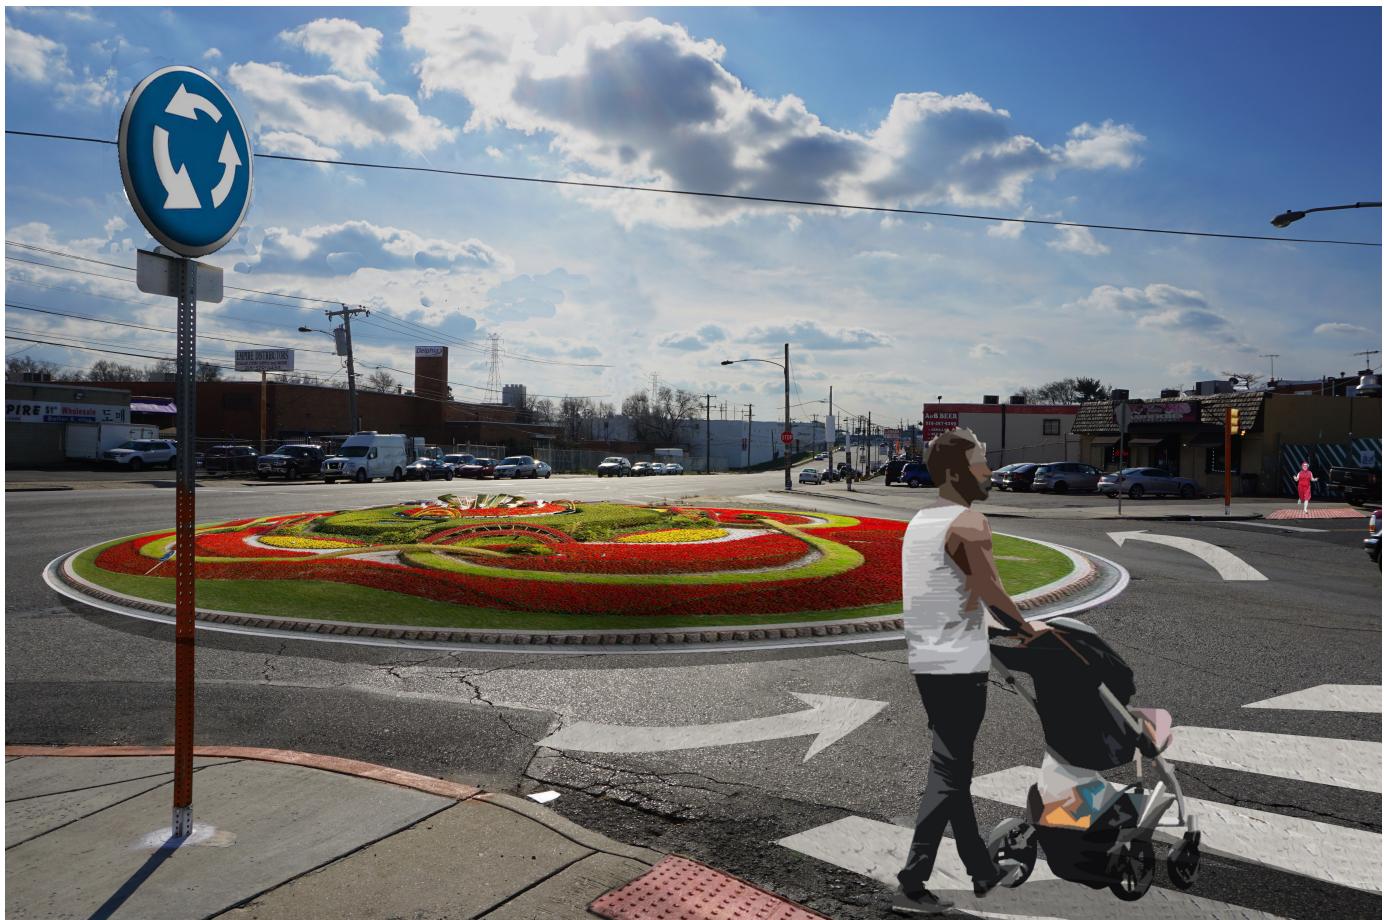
Rendering of a roundabout at the intersection of Whitaker Avenue, Wingohocking Street, and D Street.
